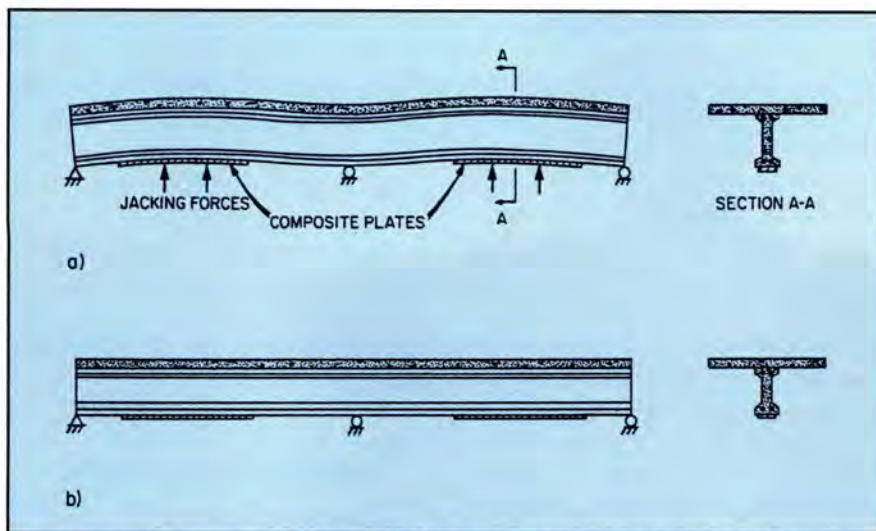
External prestressing of concrete girders with epoxy bonded FRP plates — (a) camber by jacking; (b) jacks are removed when epoxy has cured.
